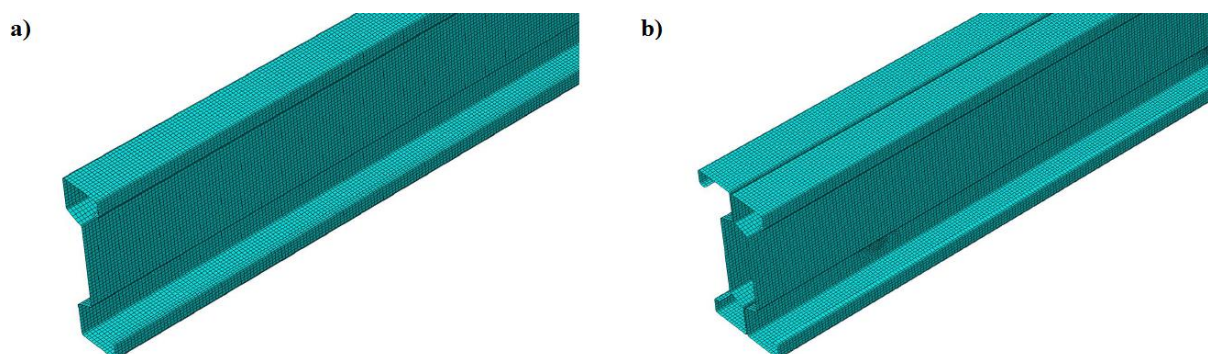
Detail of the finite element size used in both sigma-plus columns, a) single and b) built-up.
